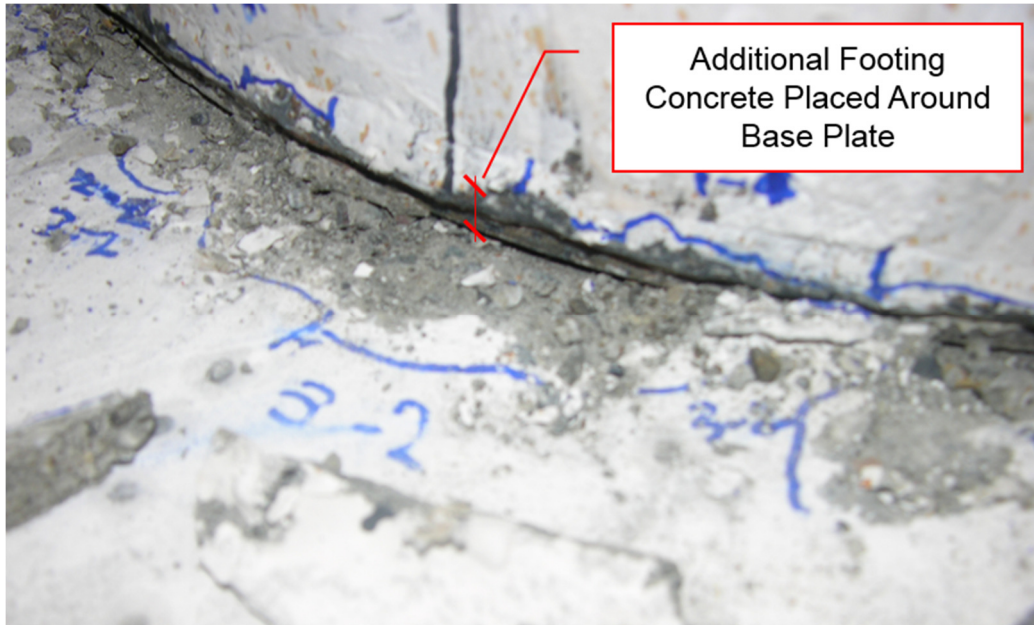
Additional footing concrete that had been placed around the baseplate of PreT-SF-ROCK; photo taken after the concrete had broken off (adapted from Schaefer et al., 2014a).
